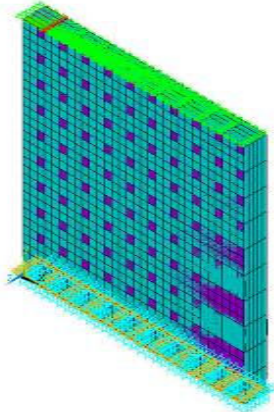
FEM model of twin steel plates-concrete composite shear walls
